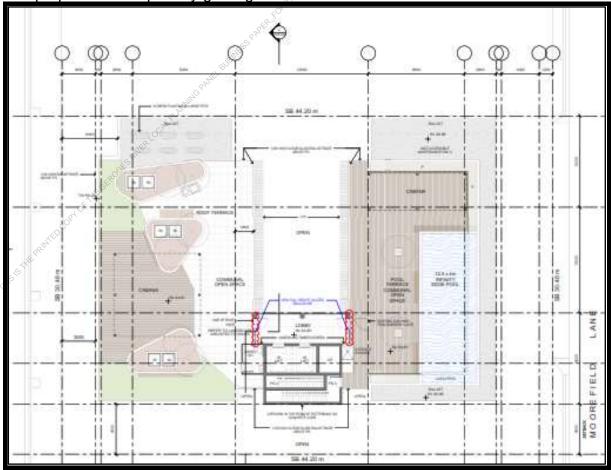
Proposed glazing clouded in red on the roof terrace plan (Source: Architectural Plans)
